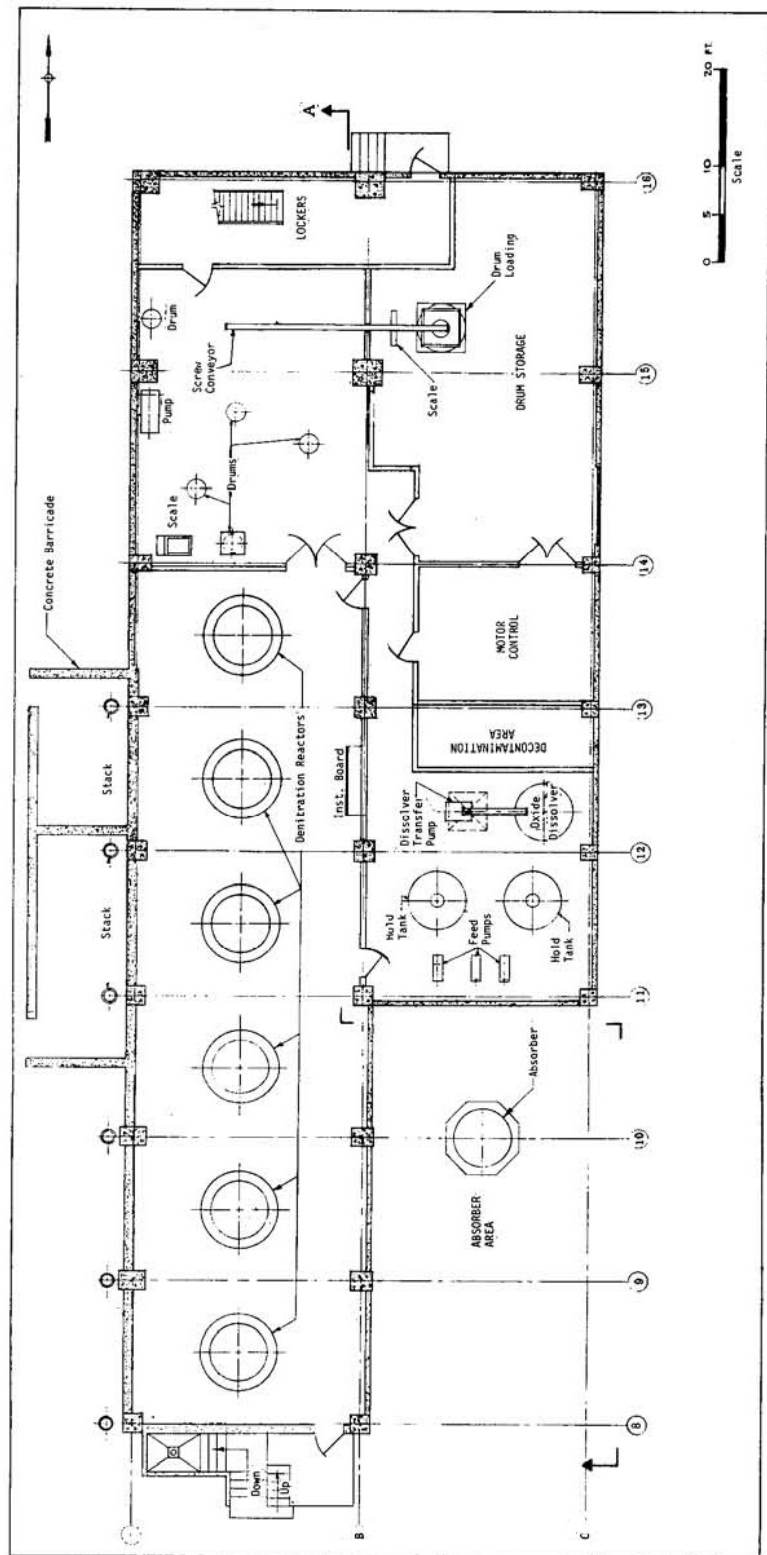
First floor view of the A-Line facility [McKibben 1976]
